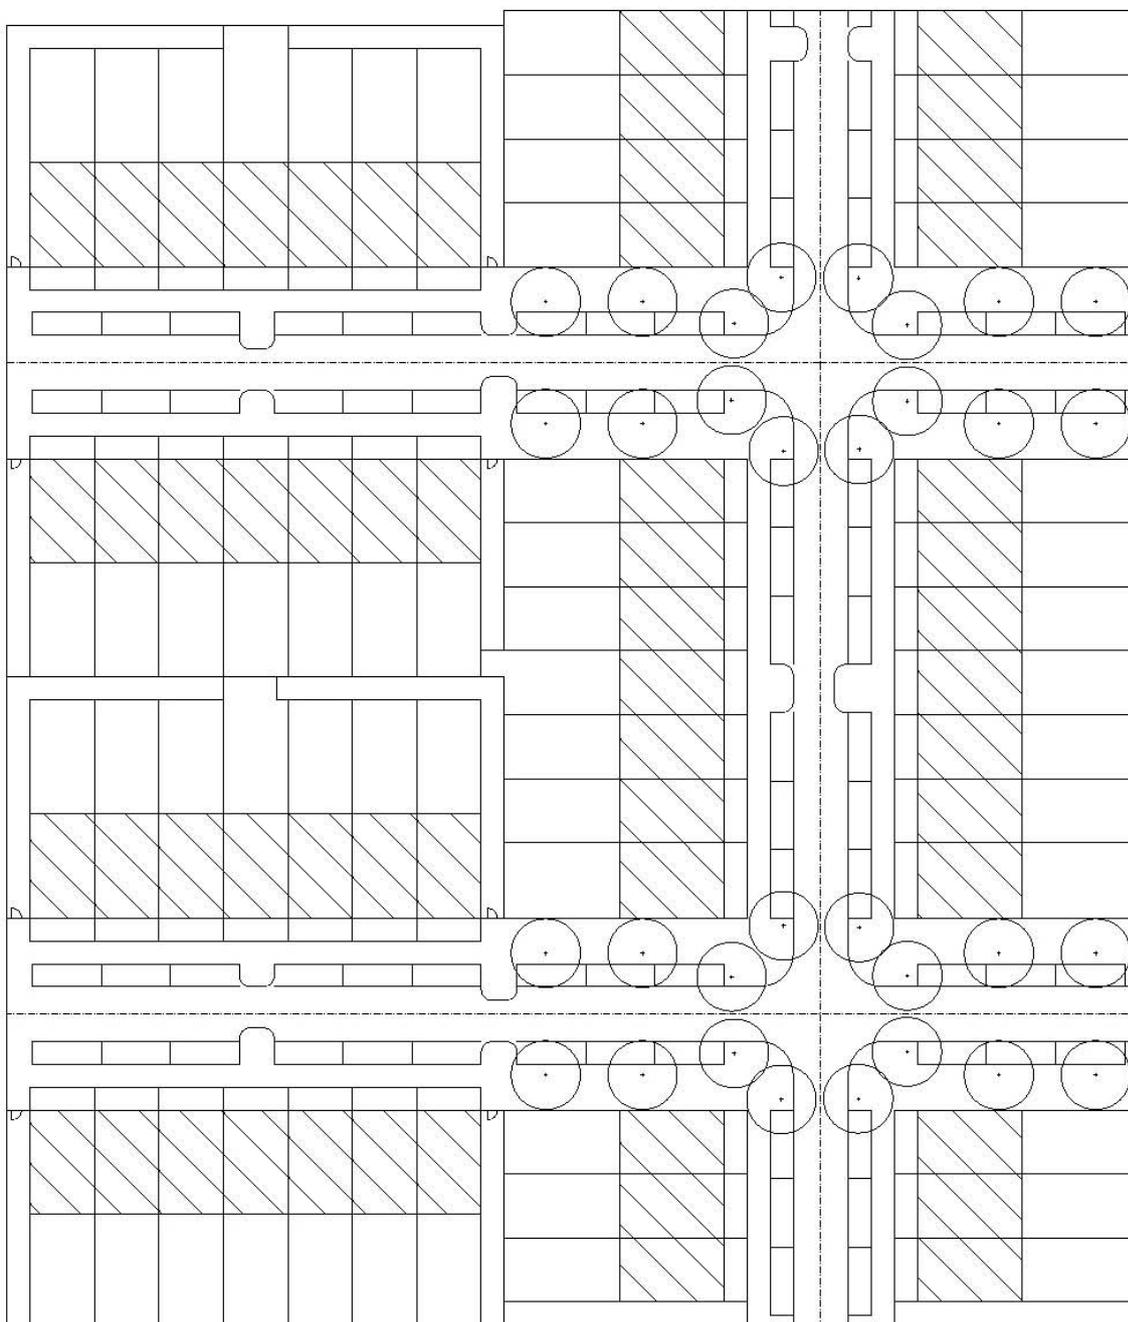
A parking ratio of 1.3:1 can be achieved with on street parallel parking.
